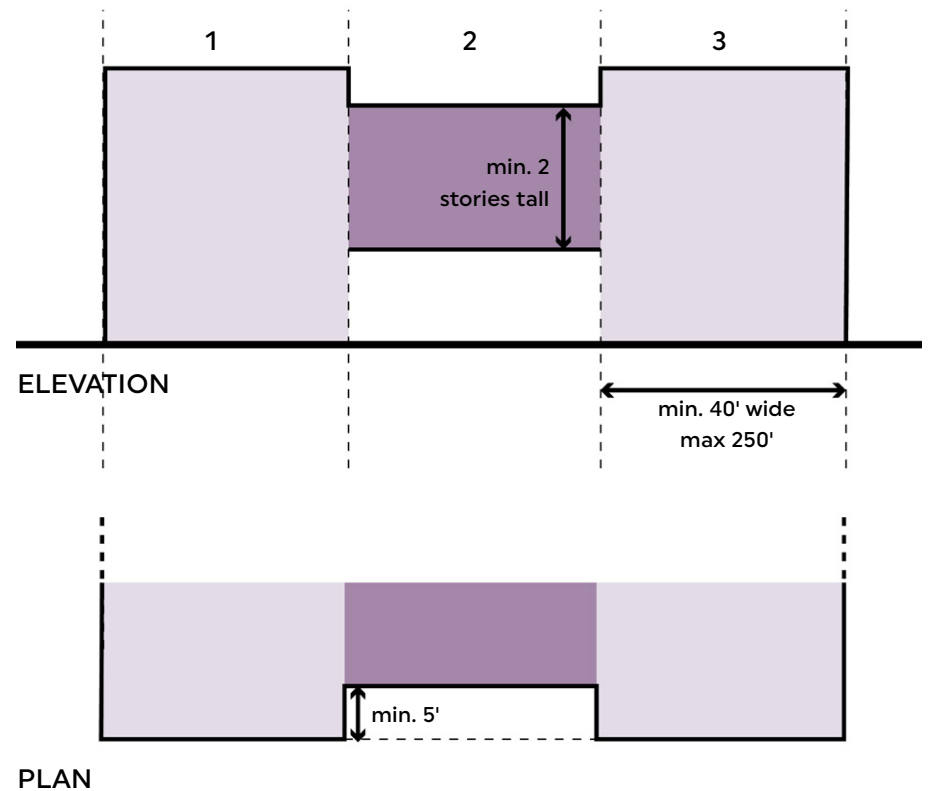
Elevation and plan of subdividing the mid-rise; here illustrating minimum subdivisions for facades longer than 250 feet
